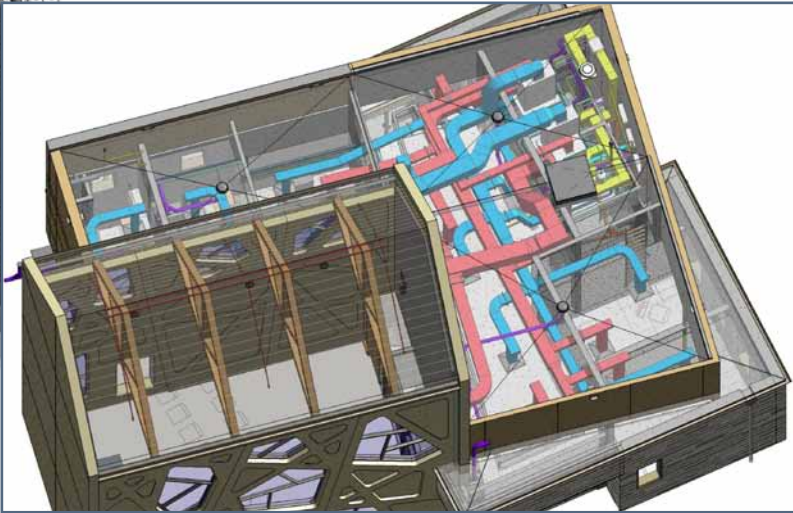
3D Roof framing analysis integrating fire protection systems.
